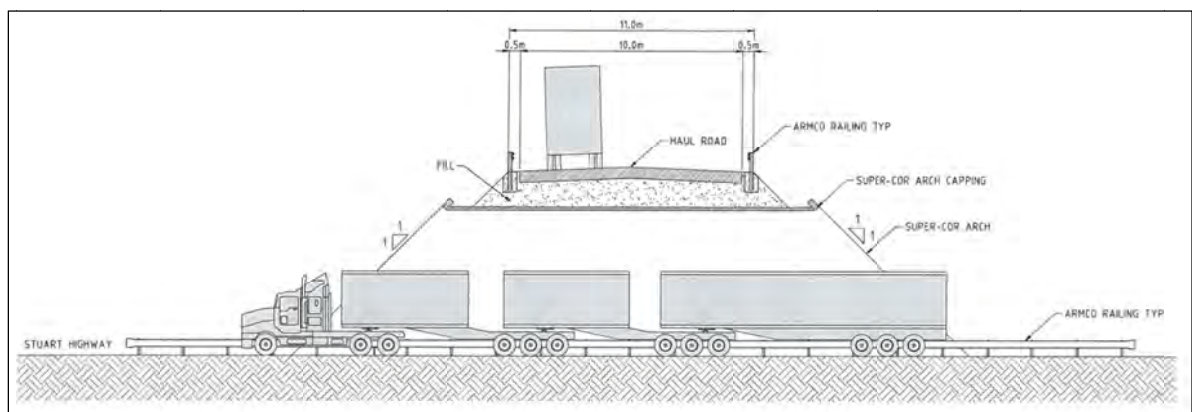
Option 1 – Mine access road over Stuart Highway
